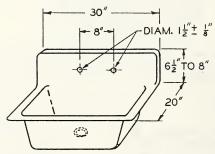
One-piece flat-rim kitchen sinks with back. (See par. 4.21.)
